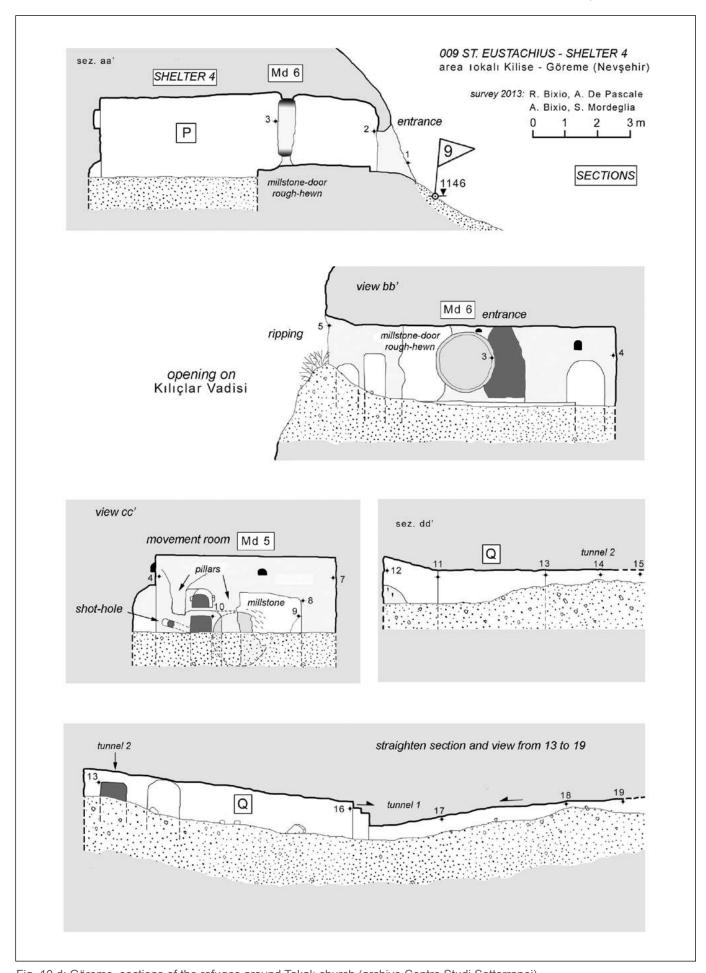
d: Göreme, sections of the refuges around Tokalı church (archive Centro Studi Sotterranei).
